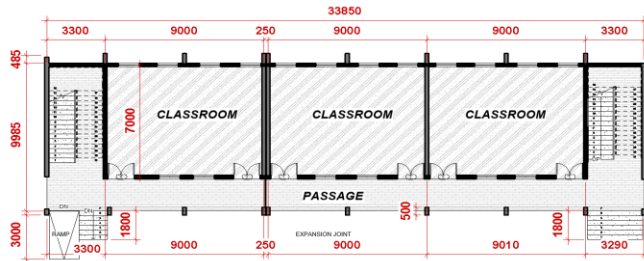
Floor plan of the sampled building. (Source: MDG Projects, 2023)
